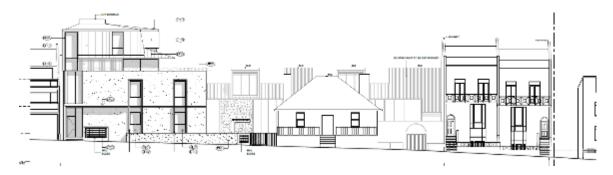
Proposed east (front) elevation of whole site to Brougham Street
